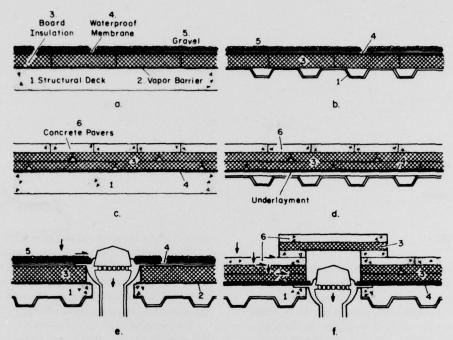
A conventional built-up roof (a, b) is compared with a protected membrane roof (c, d). The membrane, covered with insulation, stays at a temperature close to the indoor temperature. The concrete pavers are shield and ballast for the insulation. Their temperature fluctuates greatly between day and night, summer and winter. They merely shed rain, which percolates to the membrane and flows to the drain (e, f). Meltwater from the snow cover also flows because the membrane is warm. The interior drains are covered for frost protection to ensure meltwater drainage. The protected membrane serves simultaneously as a vapor barrier and eliminates the possibility of trapping moisture in the insulation, as in the conventional roof. Different types of decks are shown for comparison. The metal deck (b) is a good vapor barrier if the joints are tight. Wood, plaster or mineral boards, adhered to the fluted metal deck, are needed to form a smooth surface for the protected membrane in case d.
